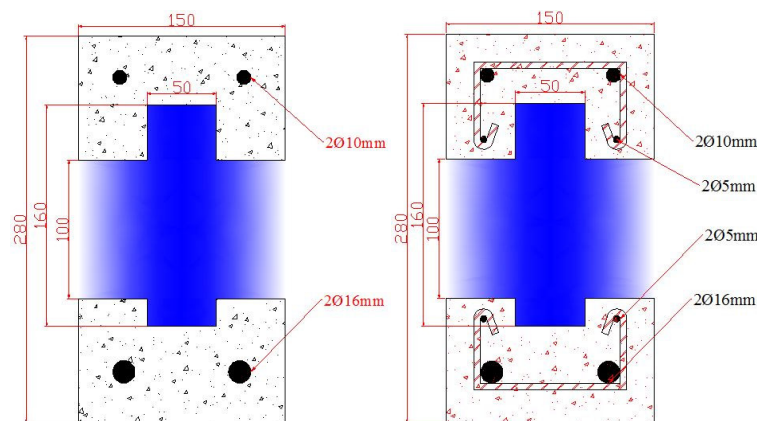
The Cork Pieces and the Fastening of it by Using Iron Wires
